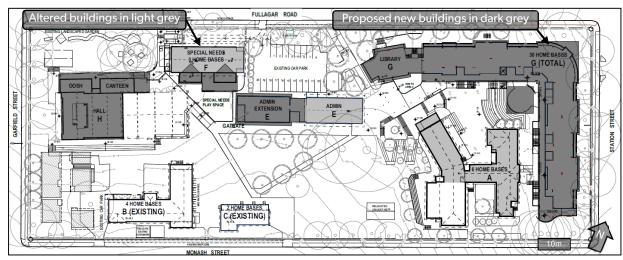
| Approved site layout (Source: Department's original assessment report 2019)
